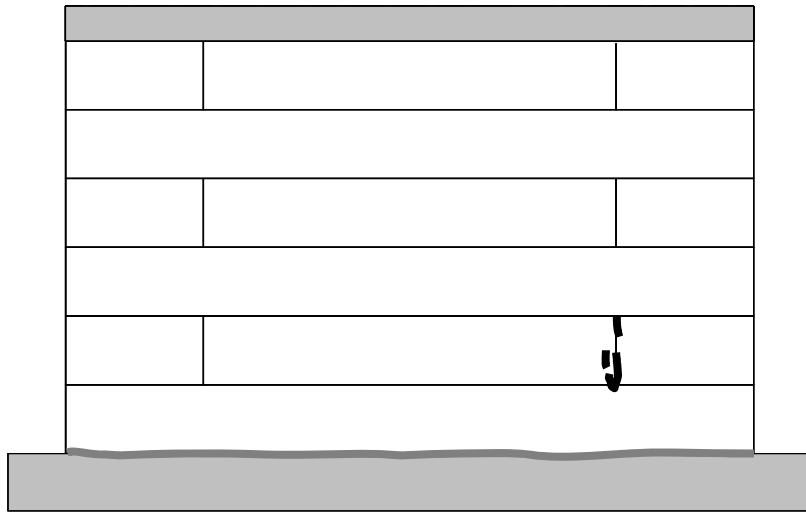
Cracking of Shear Wall Pilot Specimen 2 during Cycle 11b (local cracking at patch)
